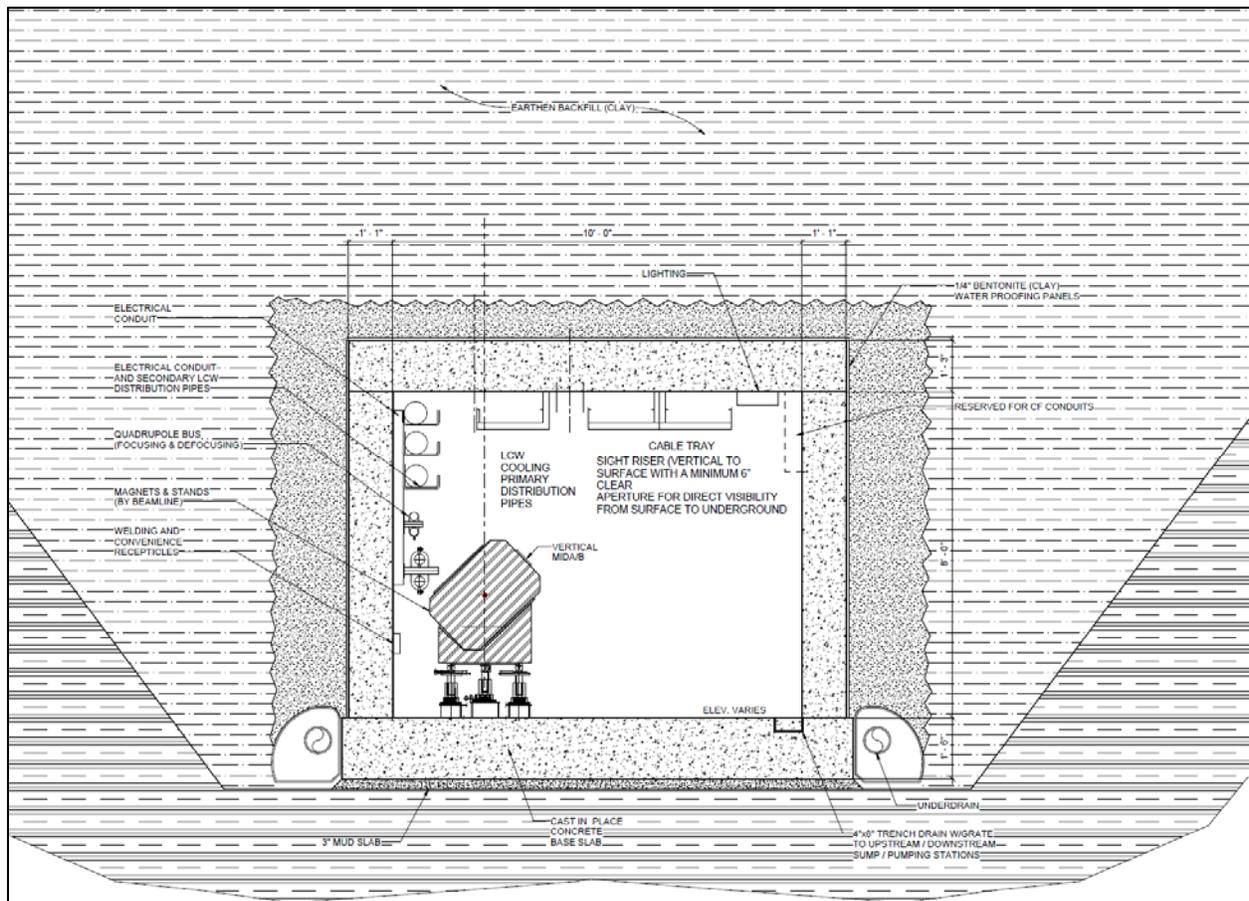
Primary Beam Enclosure Showing Technical Components, Typical Enclosure Section
